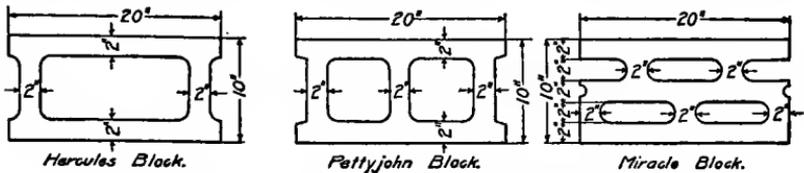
TOP VIEW OF BLOCKS SHOWING VERTICAL AIR SPACES.
